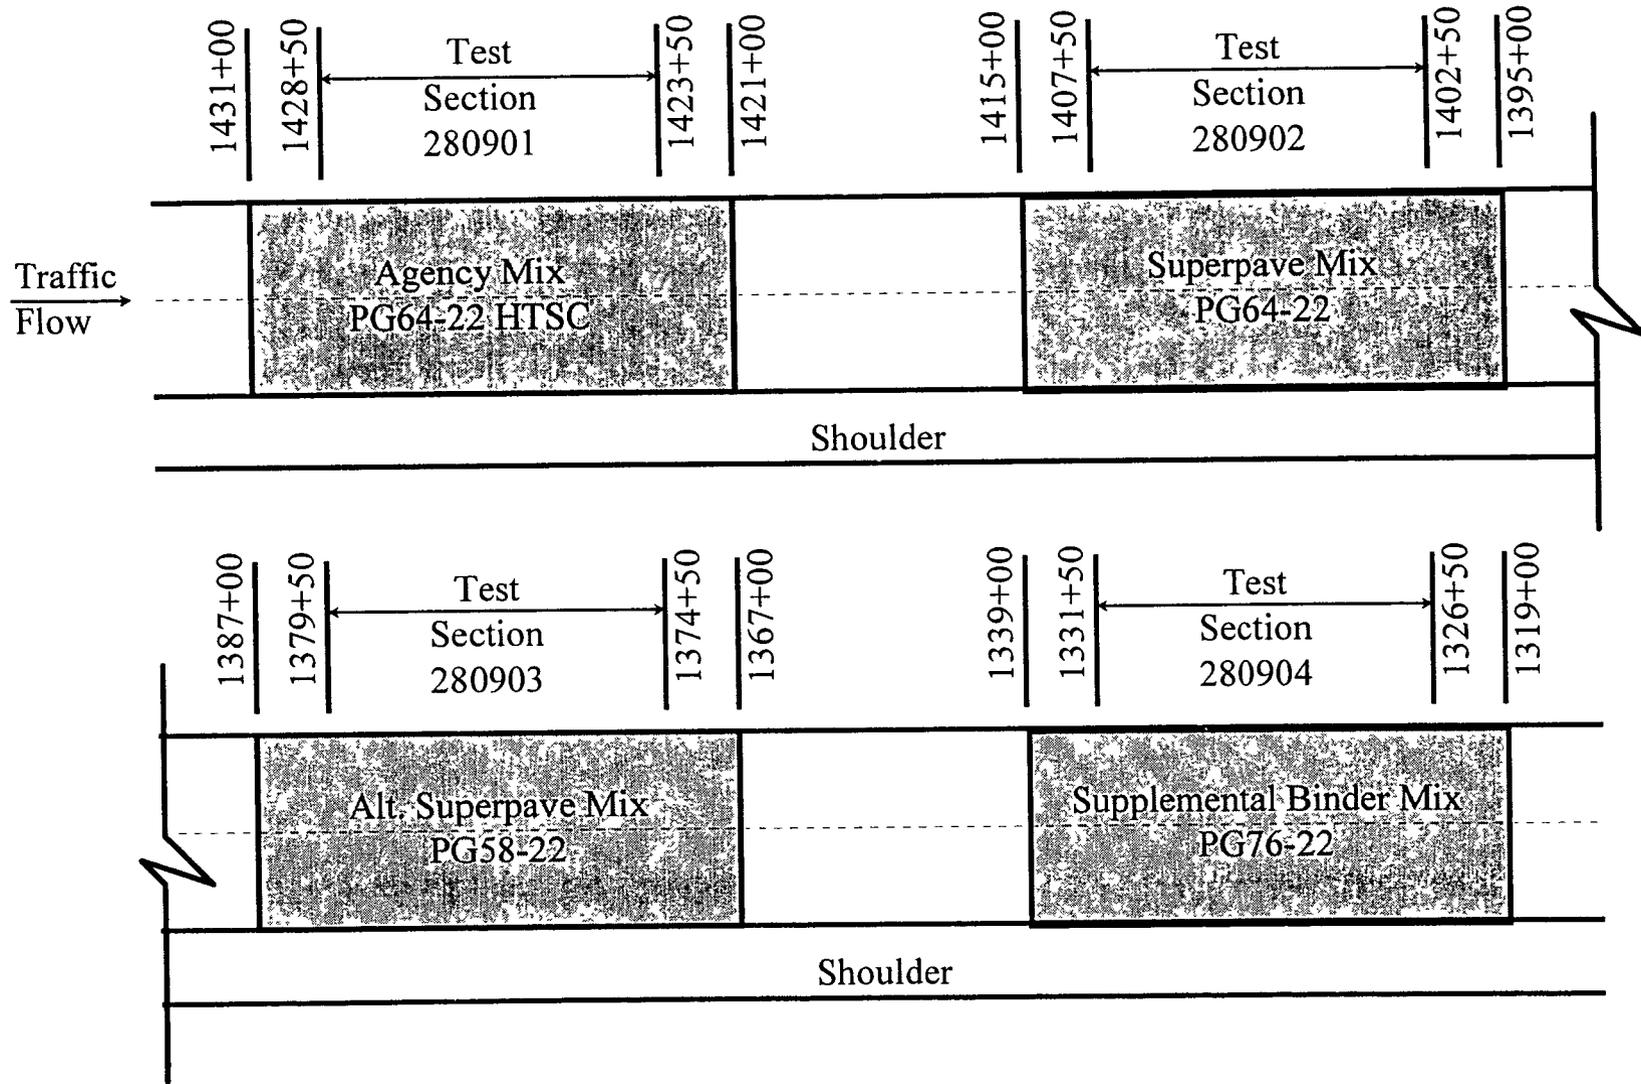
LAYOUT OF TEST SECTIONS MISSISSIPPI SPS-9A (280900)
